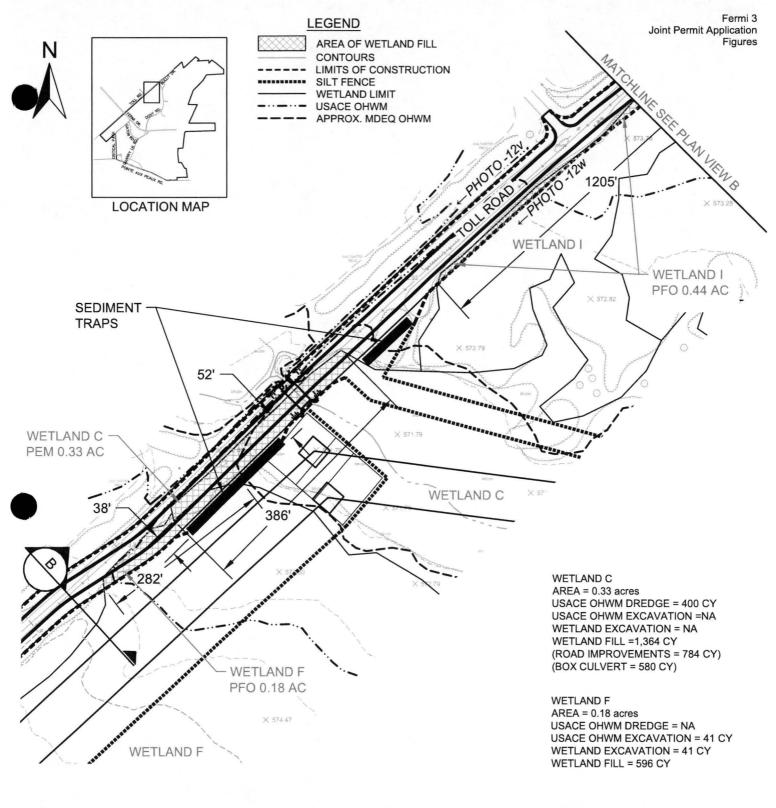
B NEW OPERATIONS ACCESS ROAD 22'x7' BOX CULVERT PLAN VIEW
